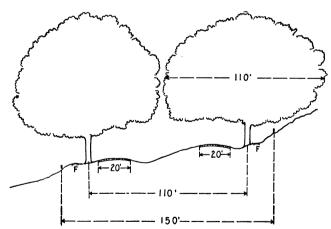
A 150-foot right-of-way with two 20-foot roadways 50 feet apart and the trees 20 feet beyond the center line of the road. The footpaths (F,F) are outside the tree rows.
